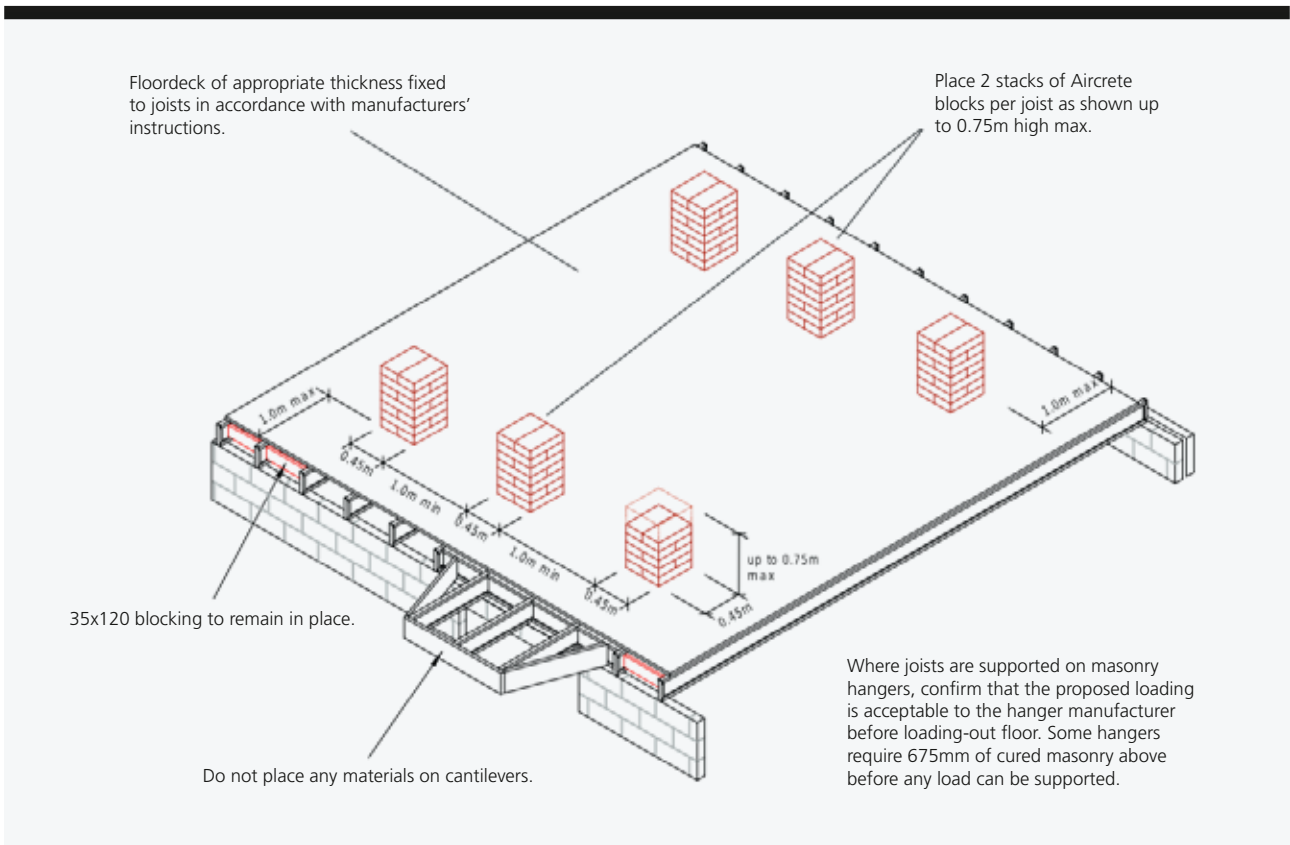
Loading-out of LAC blocks up to 1500kg/m<sup>3</sup> onto a decked floor.
